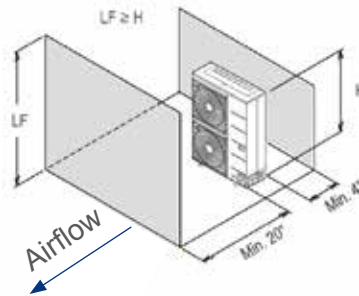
Single Unit—high front and rear walls with building overhang and no side walls
